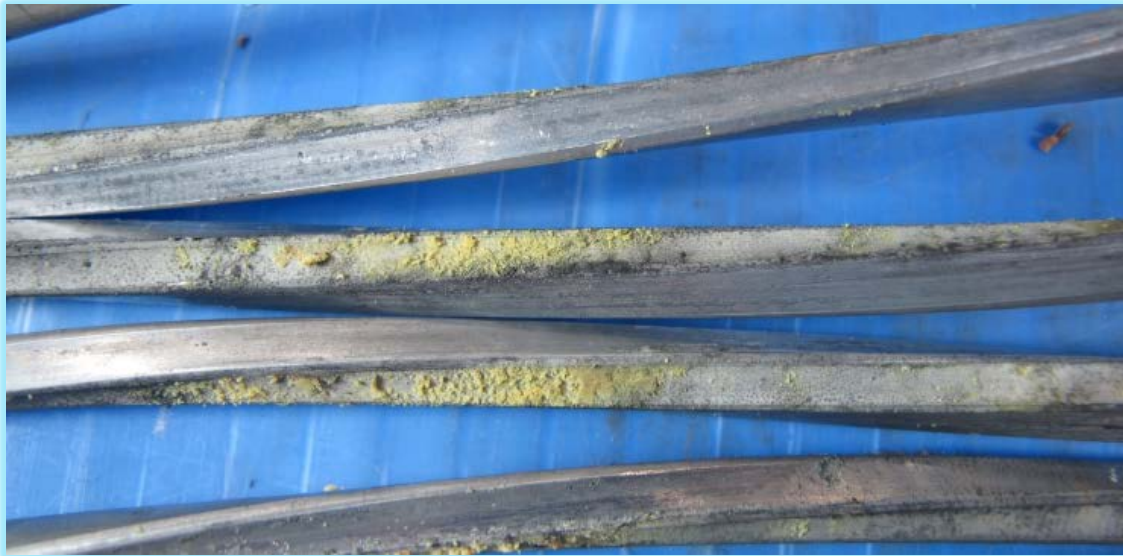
L2312, Str. 39-40, Inner Aluminum Layer yellow corrosion products
